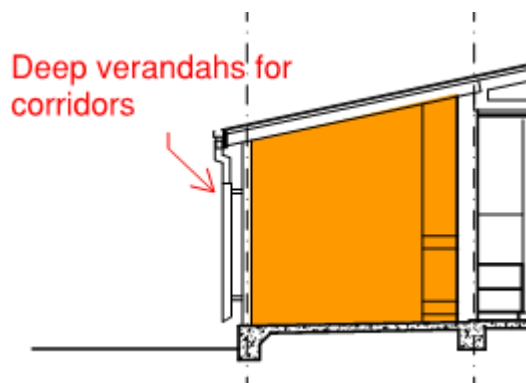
Overhang above corridors to provide rain protection, solar shading, and ventilated access between buildings. Source: Terroir
